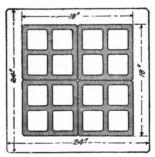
McRoy Tile, 15-Duct Conduit, Class "A" Construction.
